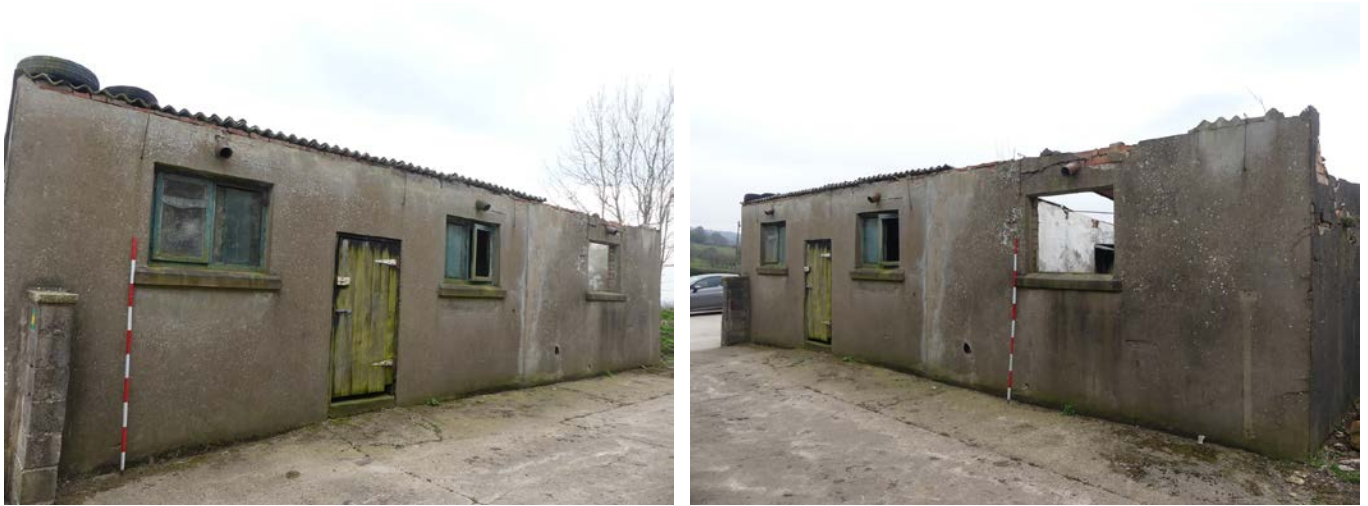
(left): North-west external elevation, Outbuilding 1, viewed from the north
